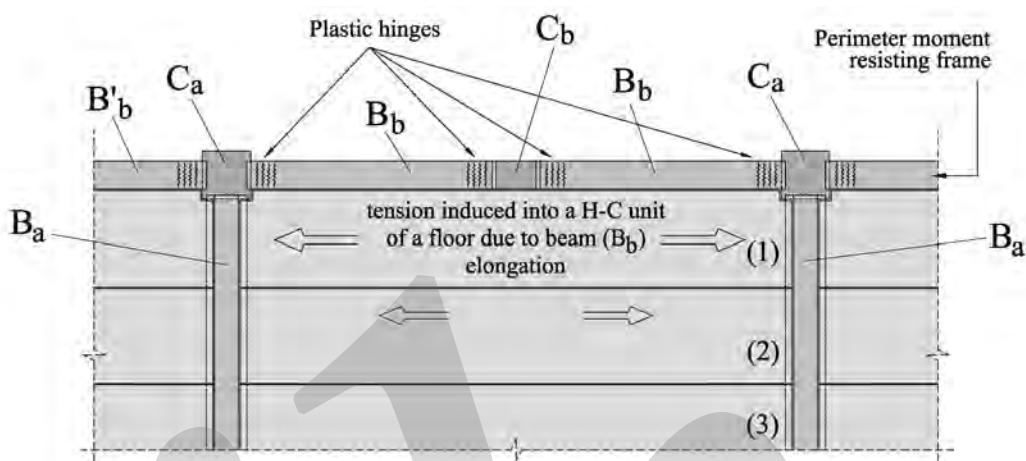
Precast hollow-core floor units adjacent to beams where a plastic hinge develops
